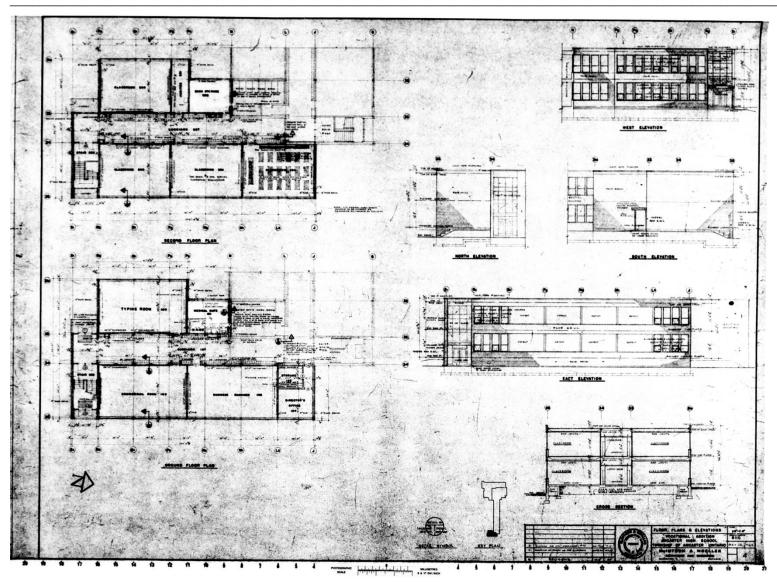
Ancaster High – McIntosh & Moeller Plan and Elevation – Addition to East Wing "Vocational Addition" 1962 (Slide 41-60: Provided by Hamilton Wentworth District School Board Archives)
